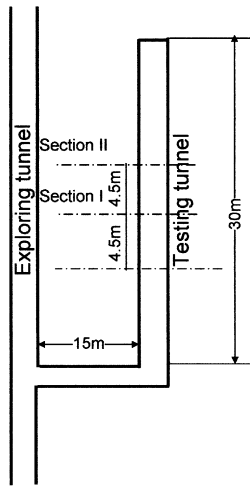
Layout plan of the monitoring in experimental tunnel.
